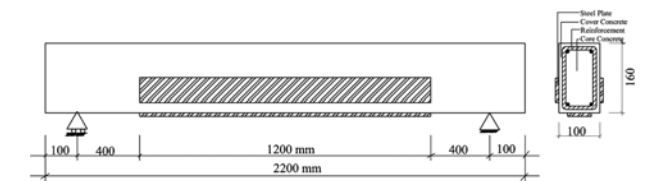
Cross-Section Detail for Strengthening with Steel Plates
